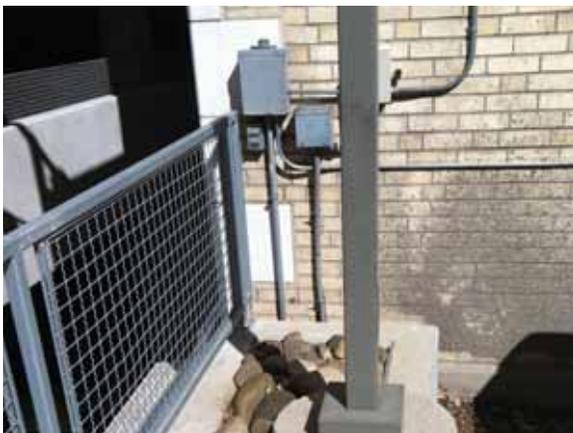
A.15 Extensive soiling of the brick observed at the southwest corner of the building.
